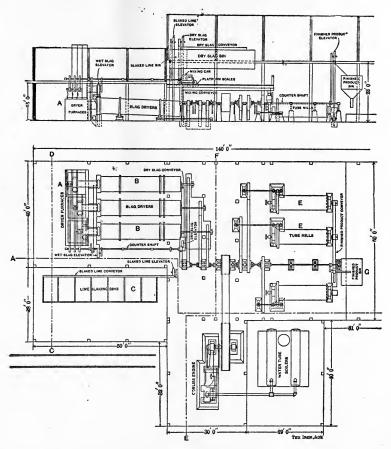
Elevation and plan of Stewart slag-cement plant. (The Iron Age.)
